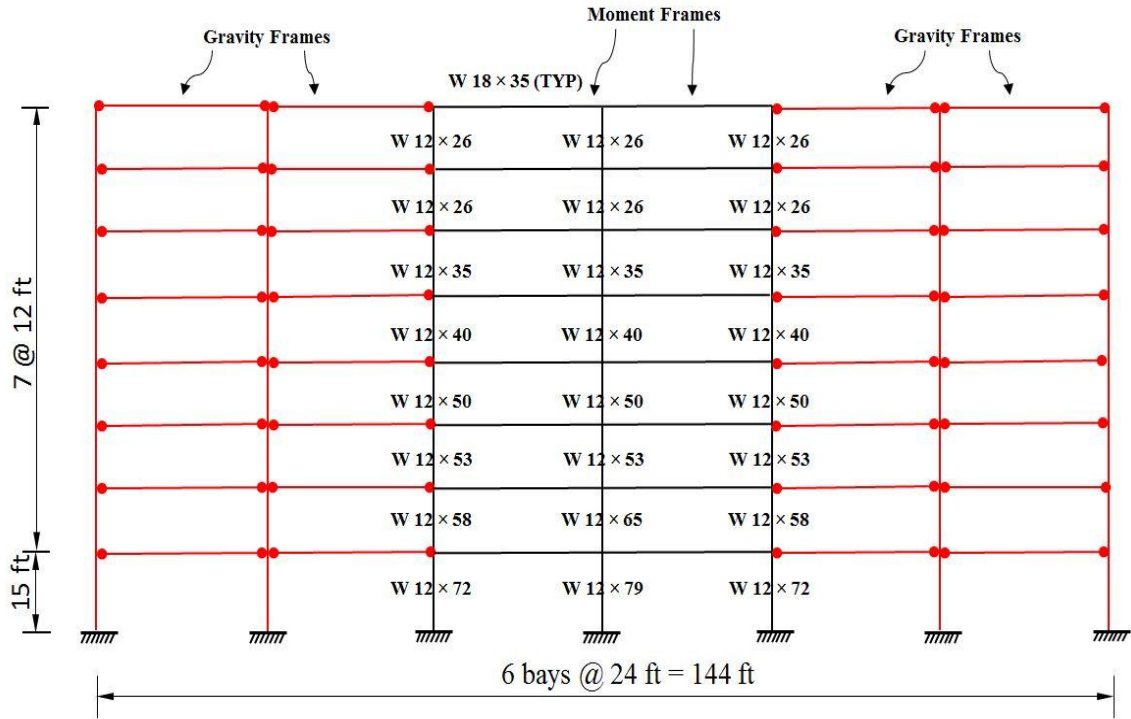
Elevation View of the Structure Located in Atlanta with Reduced Lateral Load-Resisting Bays
